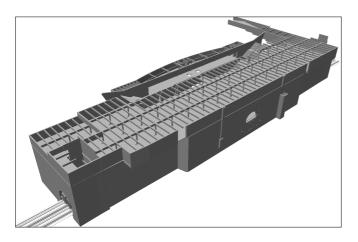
Subway Station, finishing construction works become "hidden" by the walls and slabs
